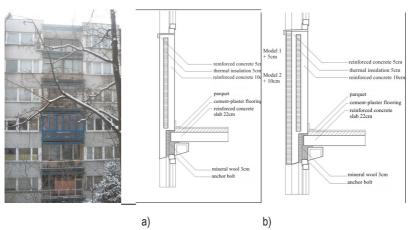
The facade of the building and details:a) existing wall structure; b) improved wall structure.
